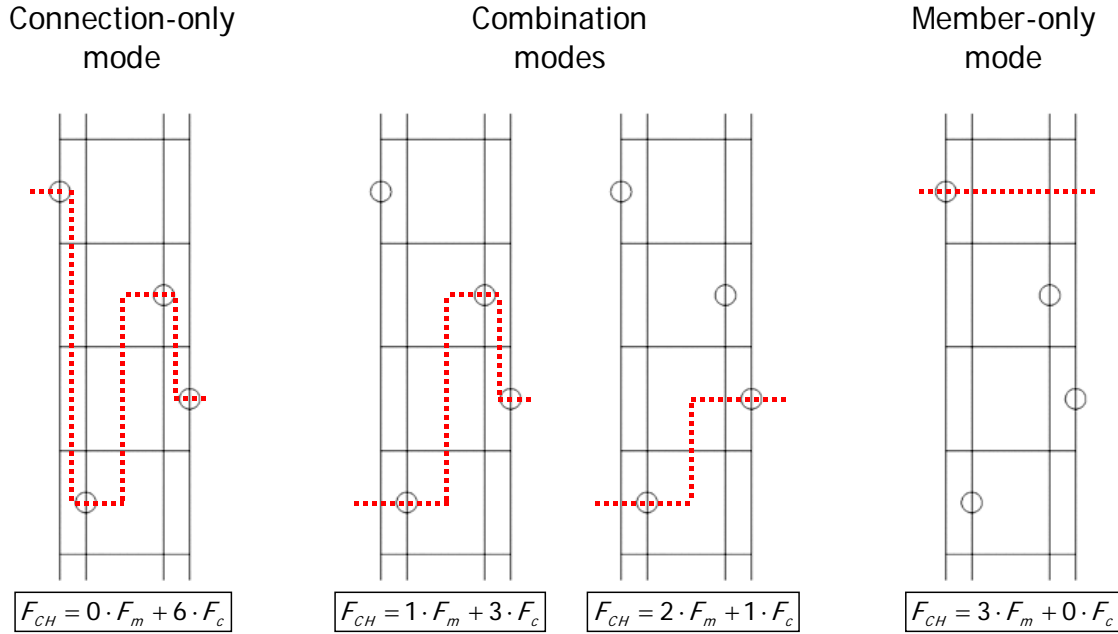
Examples of connection-only, combination, and member-only modes
